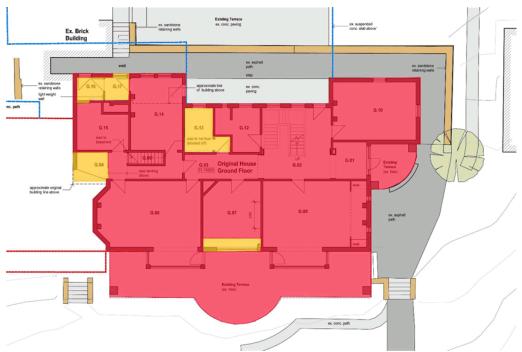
Broad areas of the building as introduced Section 4 (ground floor). Adapted from X-Squared Architects.
